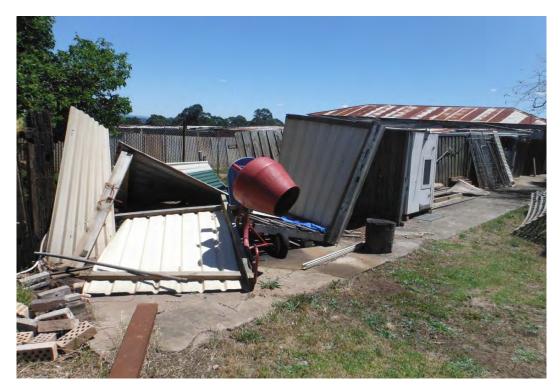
Collapsed Structure with building materials stored adjacent. Oil/Fuel staining on concrete slab and ground surface.
